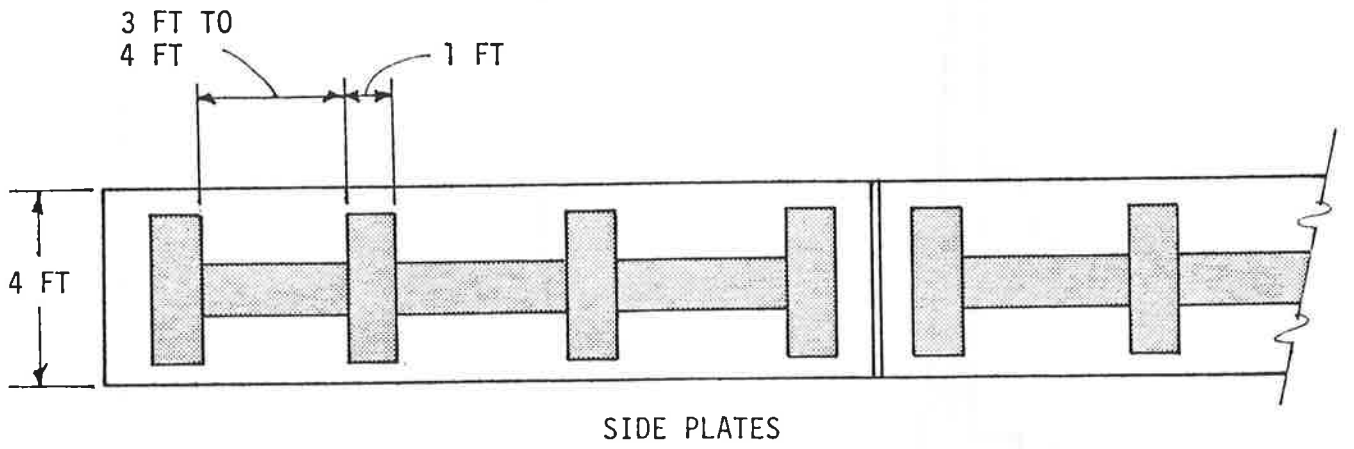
DAMPING TREATMENT PATTERN USED ON STEEL GIRDERS OF MARTA COMPOSITE STEEL/CONCRETE AERIAL STRUCTURES
